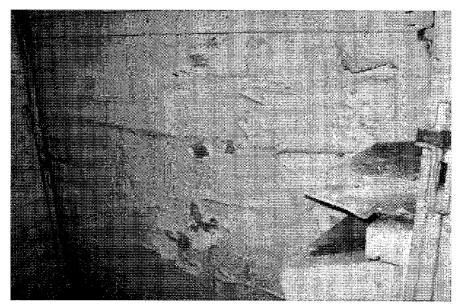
Beige paint with elevated levels of lead on the walls of the toilet of the commercial tenancy at 93 Liverpool Road
